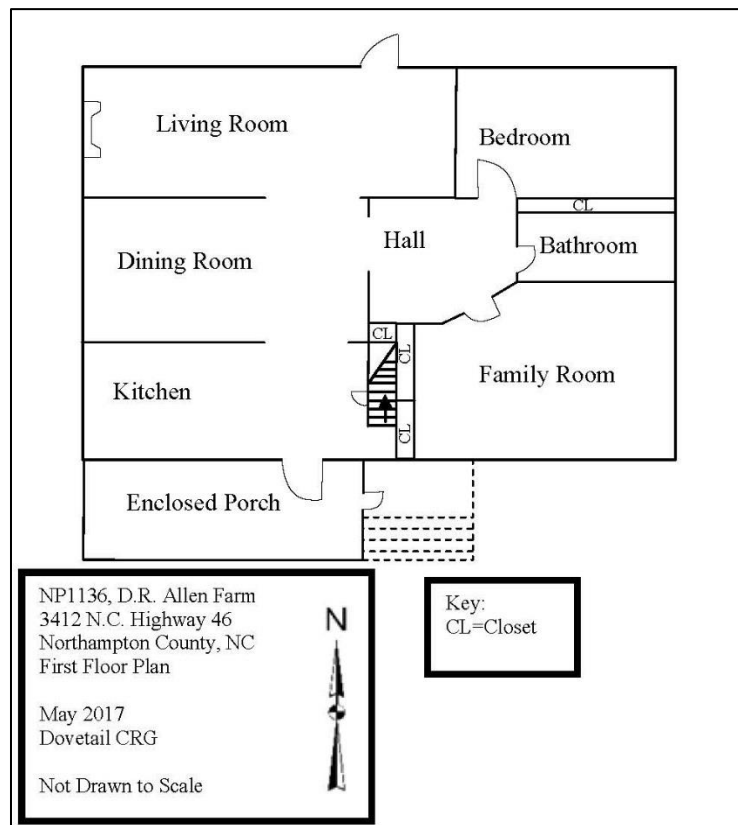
First Floor Plan of D.R. Allen Farm Dwelling (NP1136). Not to Scale.
